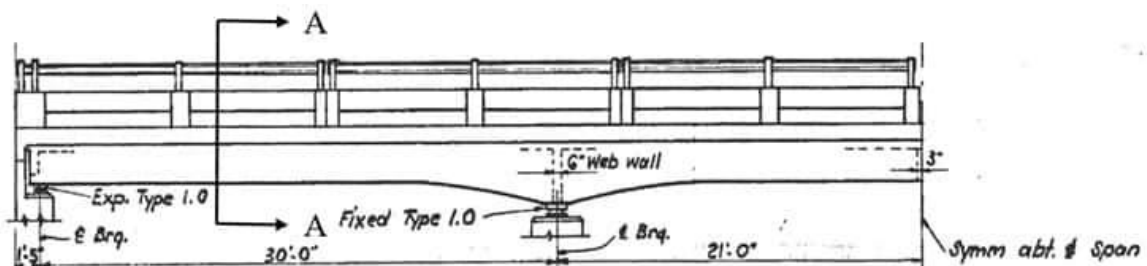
Plan View Showing Half of the Cullman Bridge (courtesy of ALDOT)
